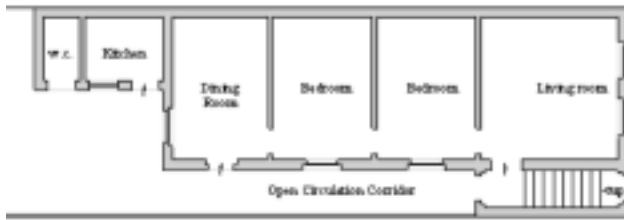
Floor plan of a Brazilian urban nineteenth-century house on a typical long and narrow lot with a side verandah as circulation space.
